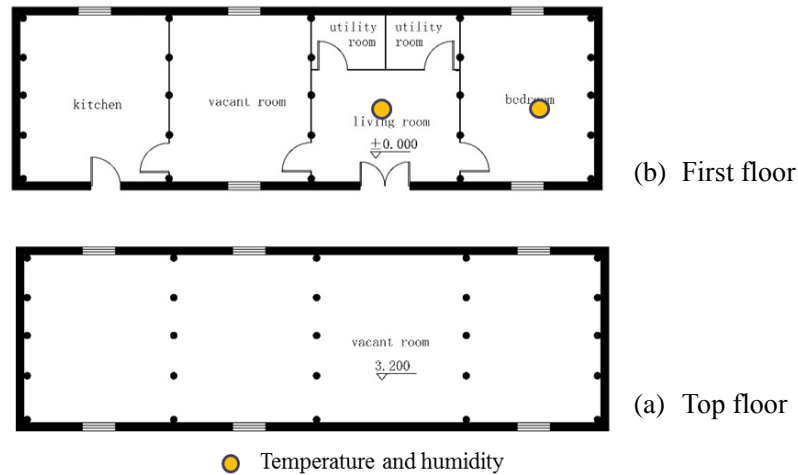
Building plan and measuring point distribution (TVB-1)
